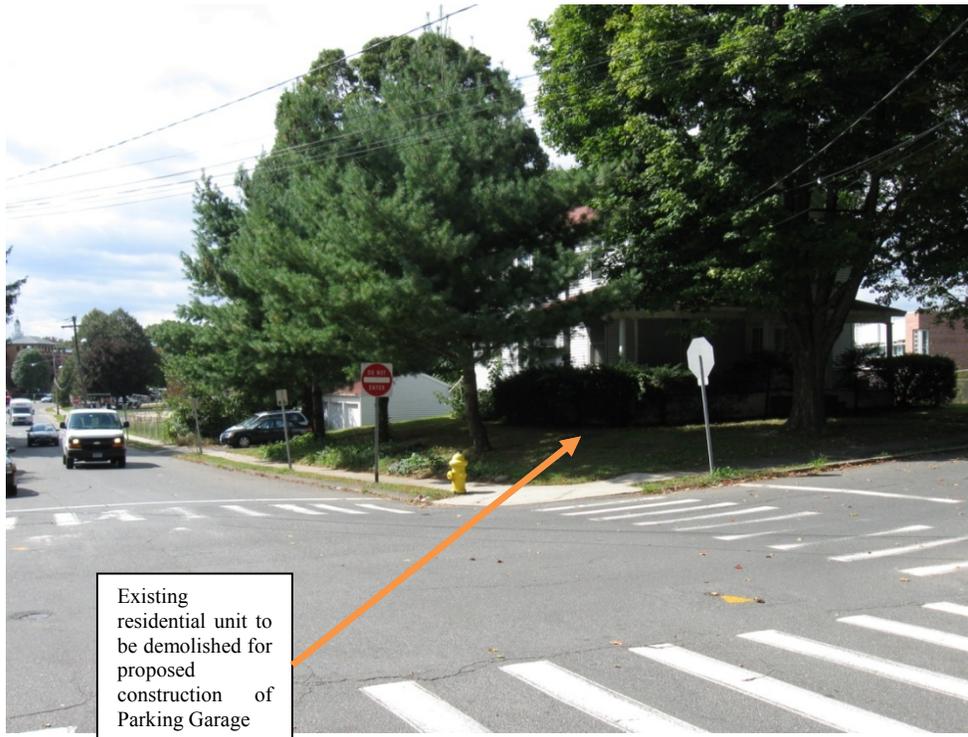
Parking Garage seen from Fifth Avenue at Midtown Campus
